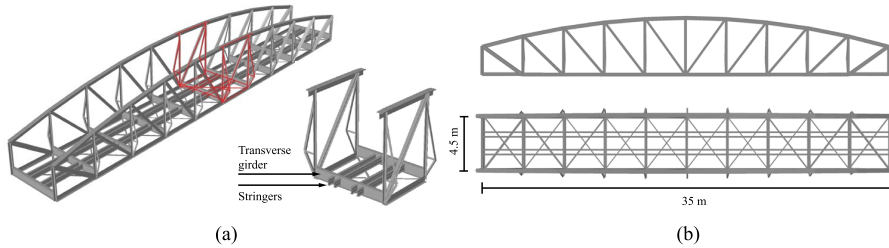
Simplified 3D model of the main structural steel in the Hell Bridge Test Arena. (a) 3D perspective view including a detailed bridge section. (b) Vertical wall (top) and plan view of the bridge deck (bottom).
